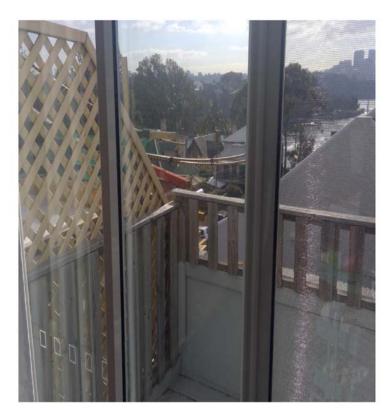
Photo of existing first floor deck balustrading and privacy screening.
